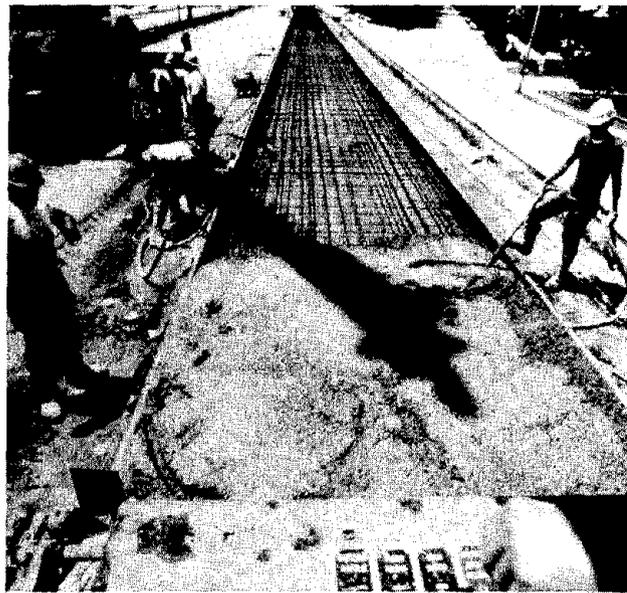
CONCRETE PLACEMENT AND CONSOLIDATION
